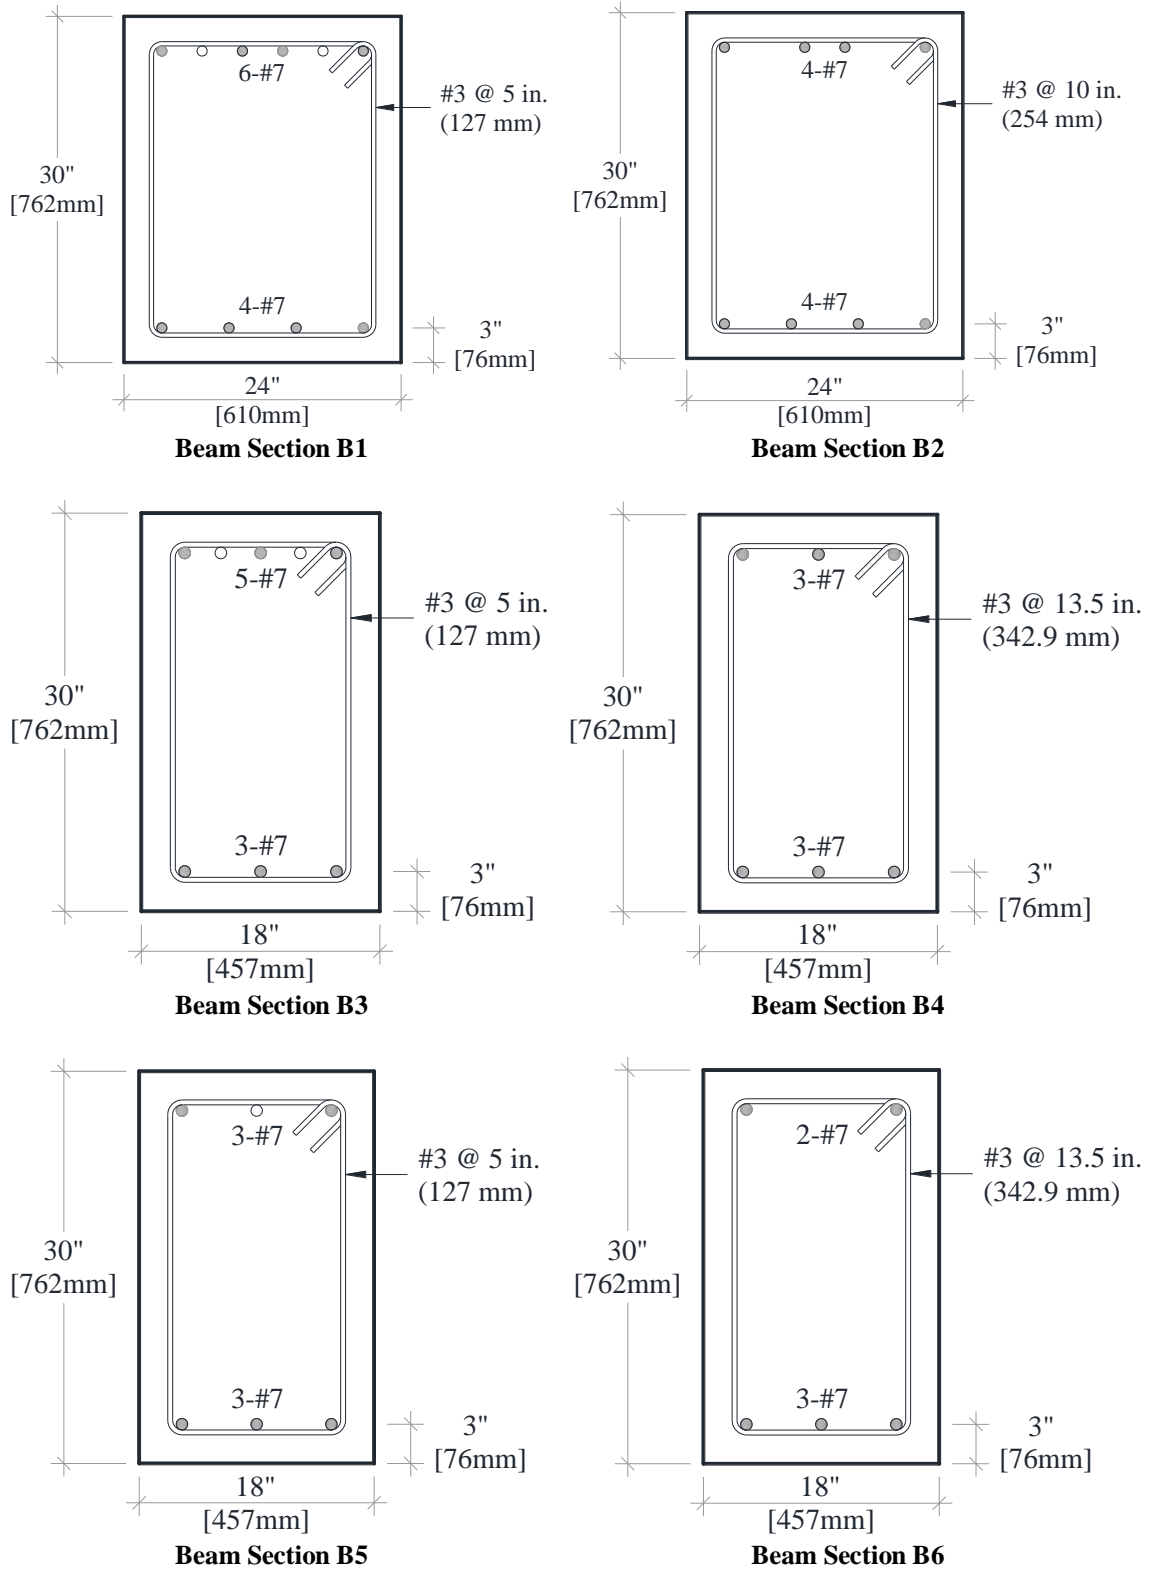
Section Details for Six-Story Special Moment-Resisting Frame
